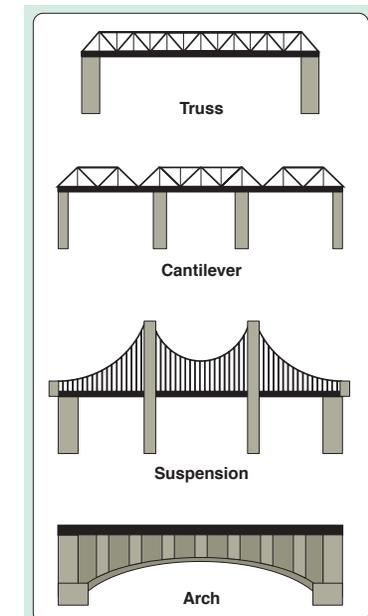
Four of the five types of bridges are the truss, the cantilever, the suspension, and the arch. The fifth is the beam bridge.
